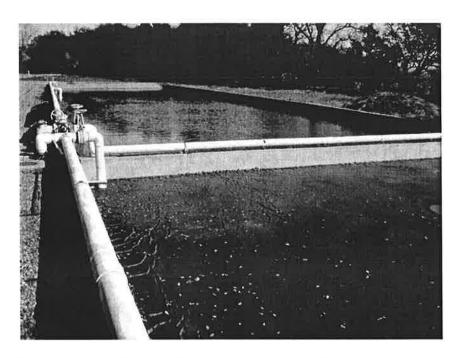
Two of the Facility's three concrete lined sludge drying beds.
